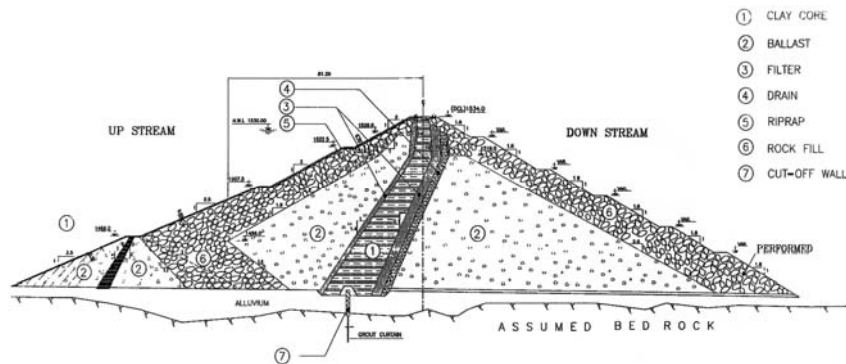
Highest cross-section (Section F-F) of Bidvaz dam
